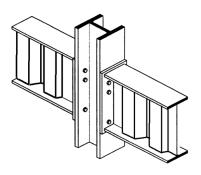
Typical flush end-plate connection of TWP beam section connected to British hot-rolled section
